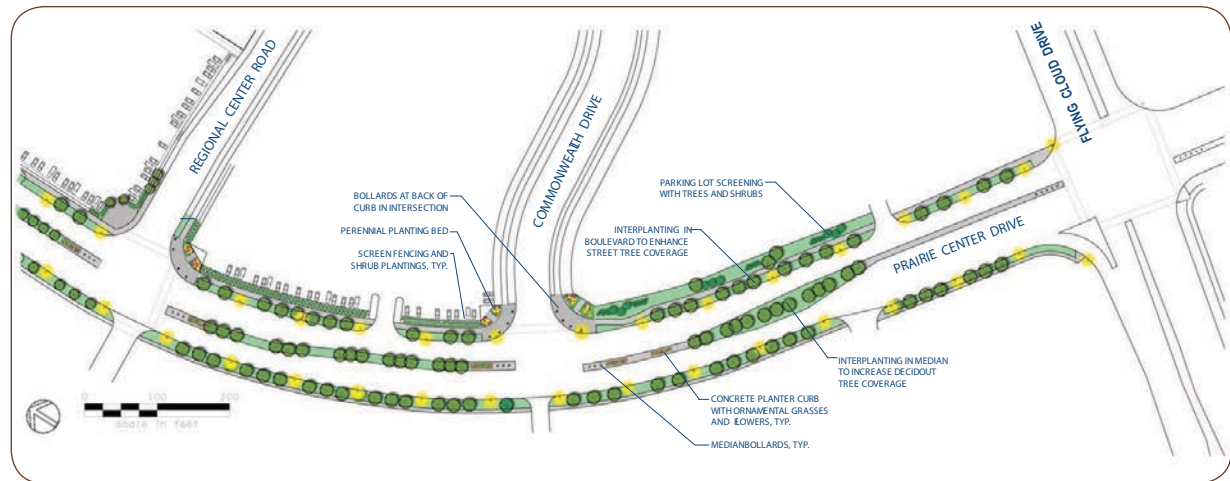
Loop Road Streetscape Concept (Prairie Center Drive/Valley View Road)
